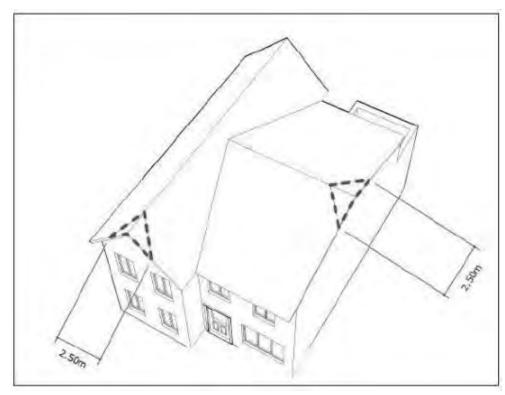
Exceptions for gable ends and dormers and roof projections
